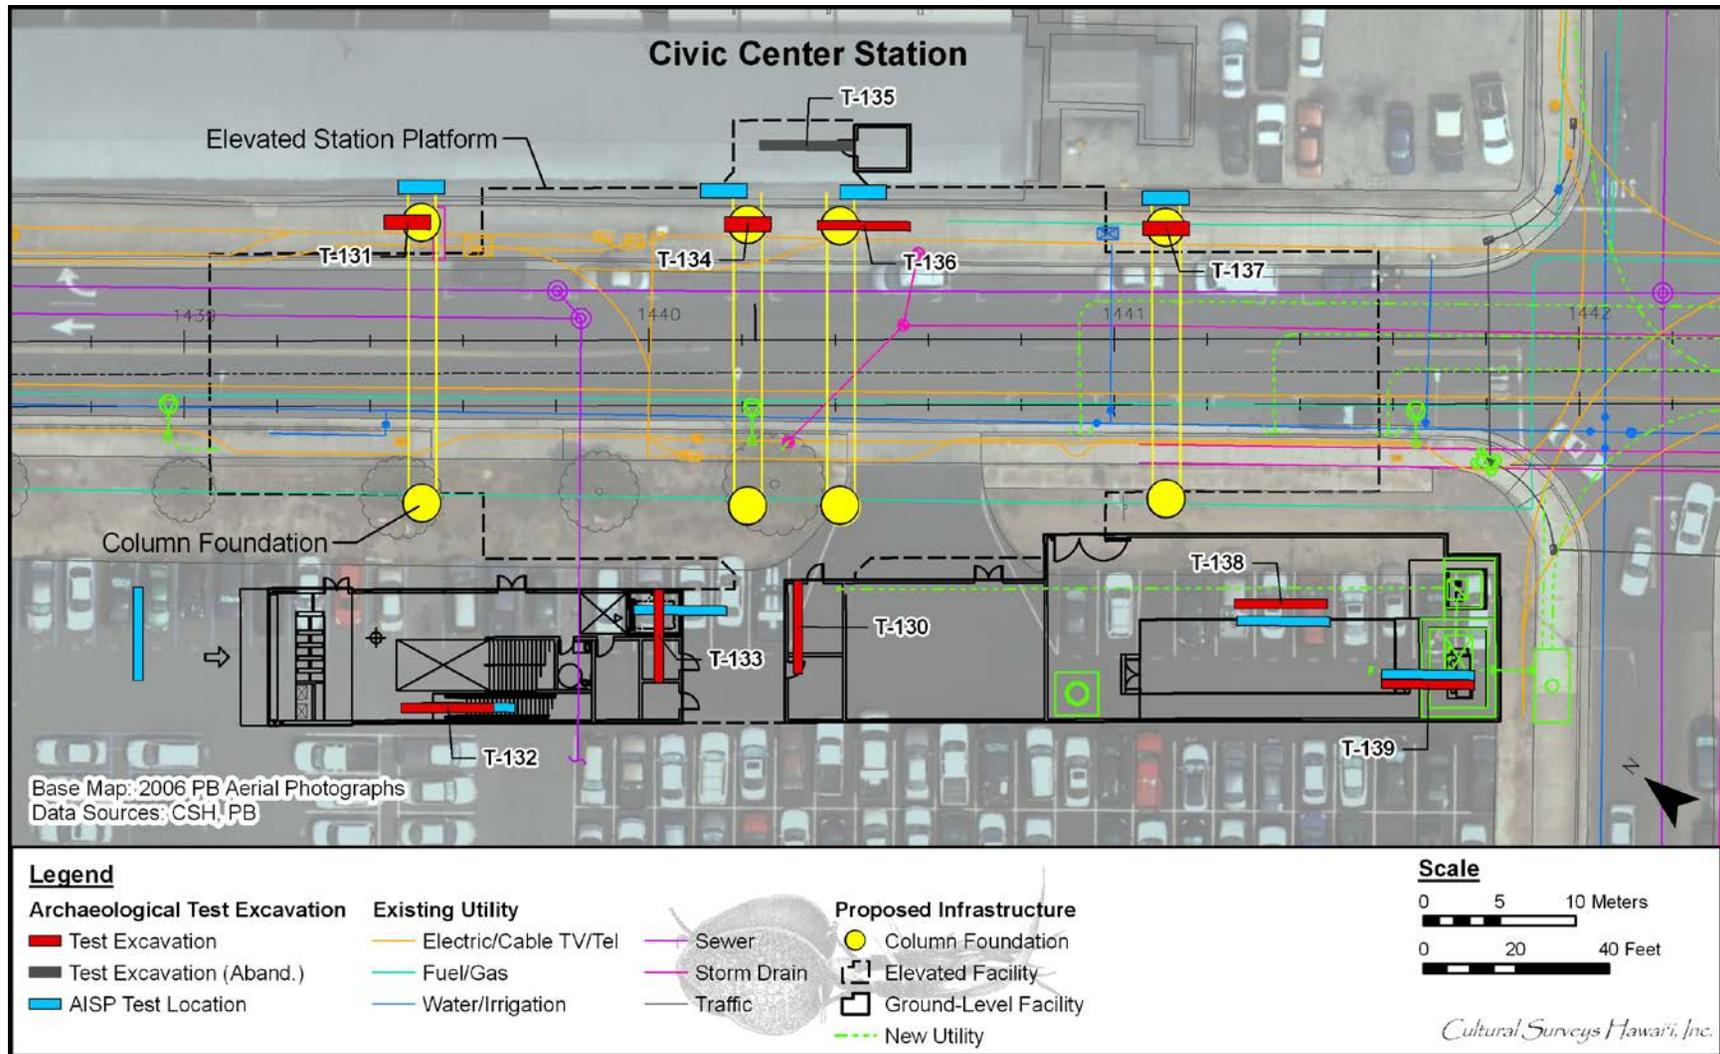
Civic Center Station, detail of column foundation layout showing locations of proposed AISP and actual AIS test excavations
